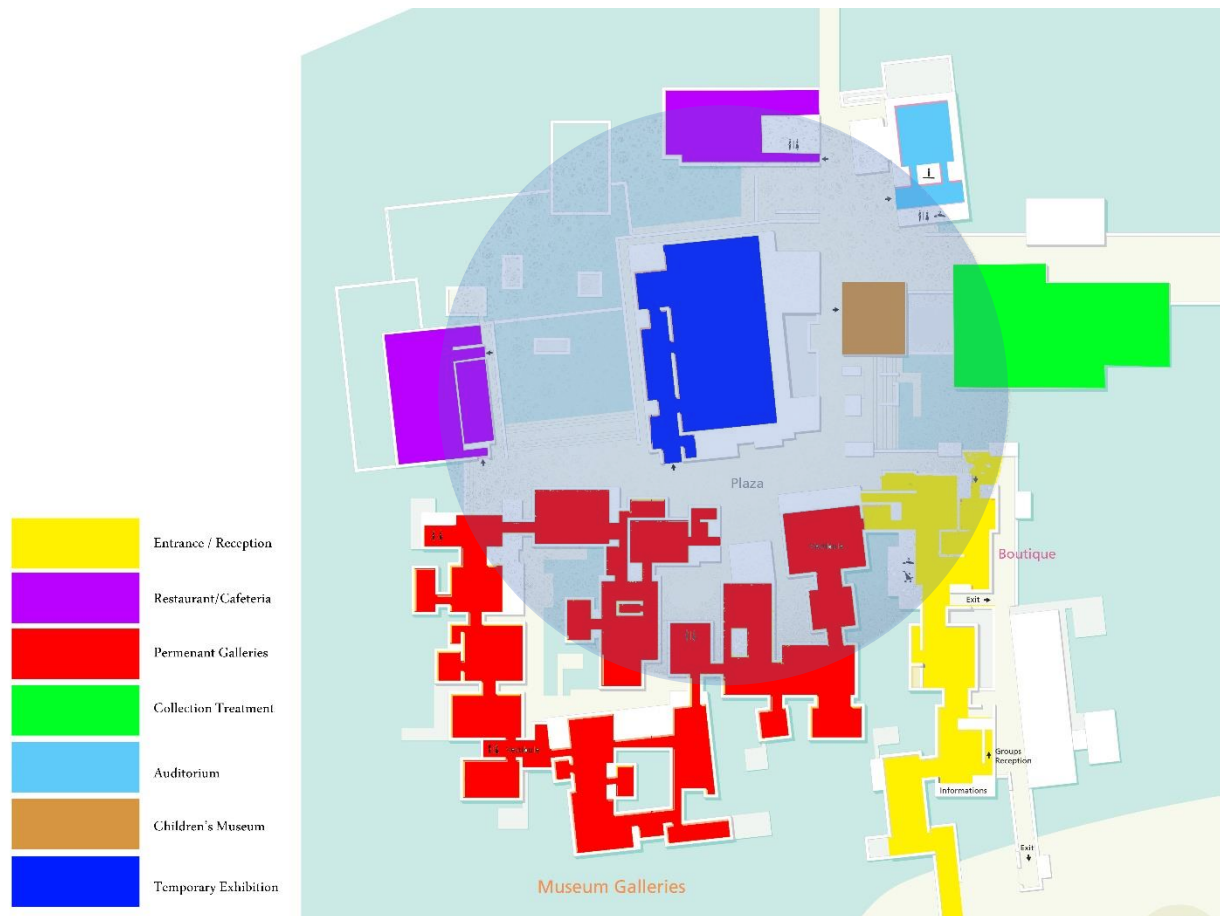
Louvre Museum Programming Layout Plan (*Louvre Abu Dhabi : inat n.d.*) (Author)
